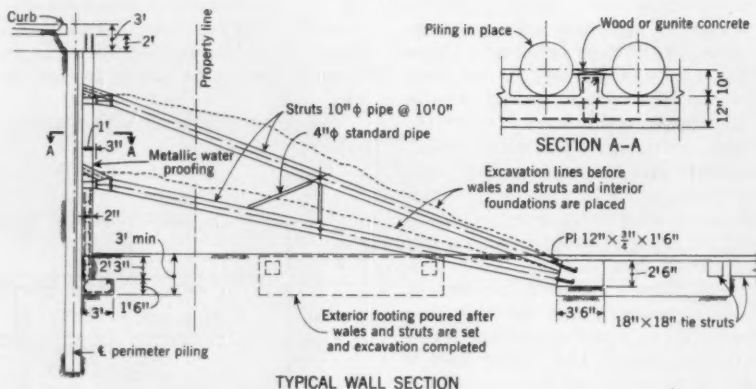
Row of concrete piles around perimeter of basement excavation was braced temporarily by pipe struts, until concrete wall and basement floors could be poured.
